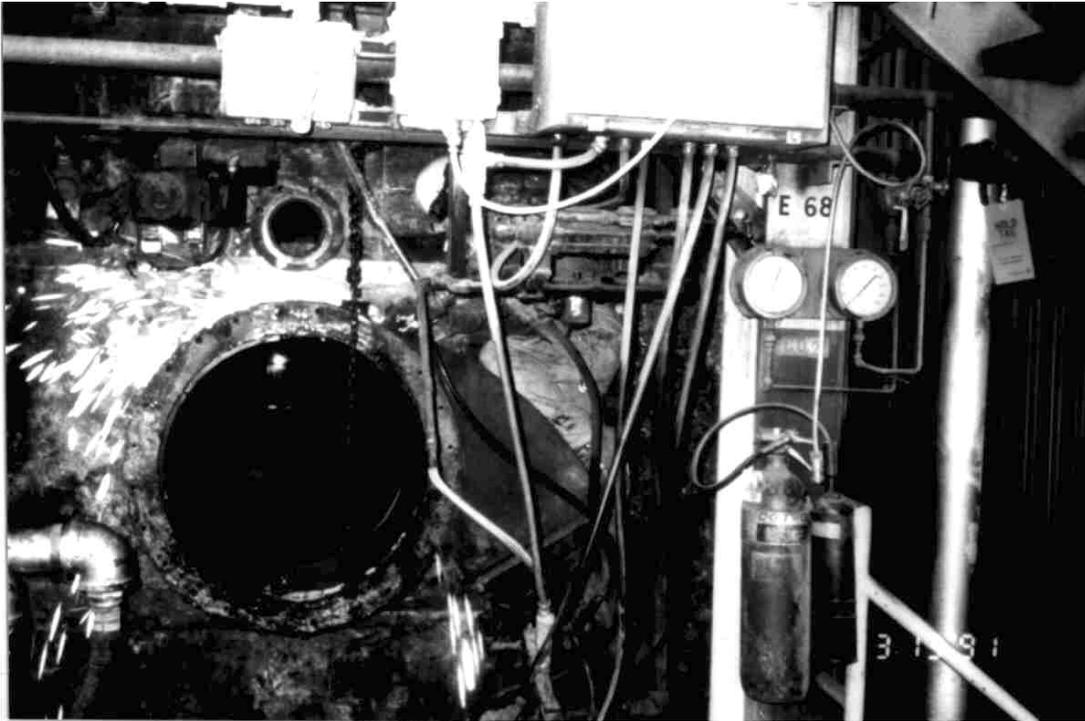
New Secondary Air Inlet Plenum and Vertical Duct to AOFA System Can Damper Inside AOFA Windbox
